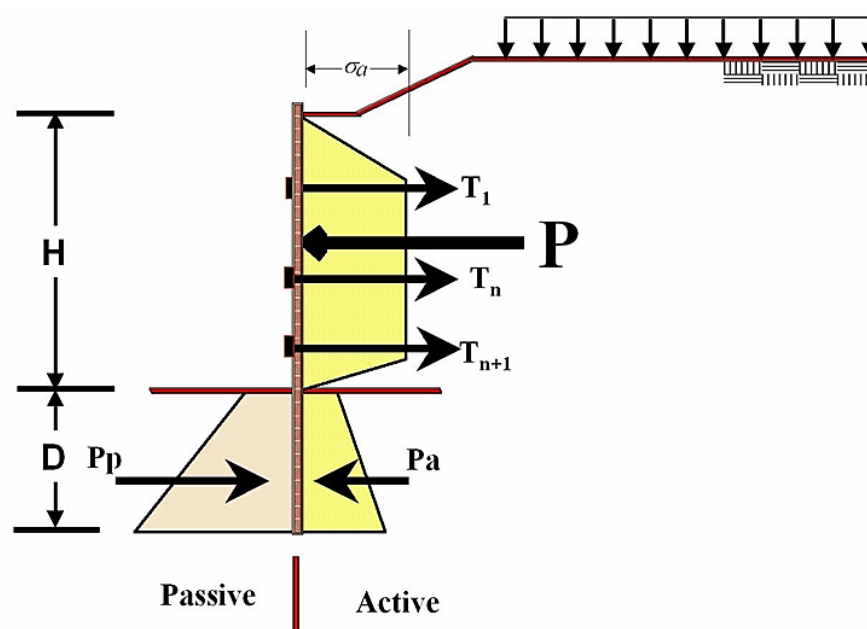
Lateral Earth Pressure for Anchored/Braced Wall
